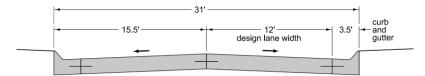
Two lane urban roadway with standard paver width of 31 feet.
